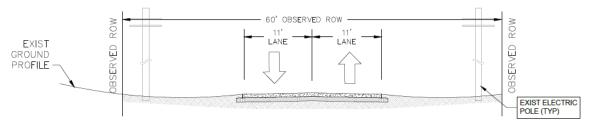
Foster Drive existing Section (between S 1st St and S 3rd St)
